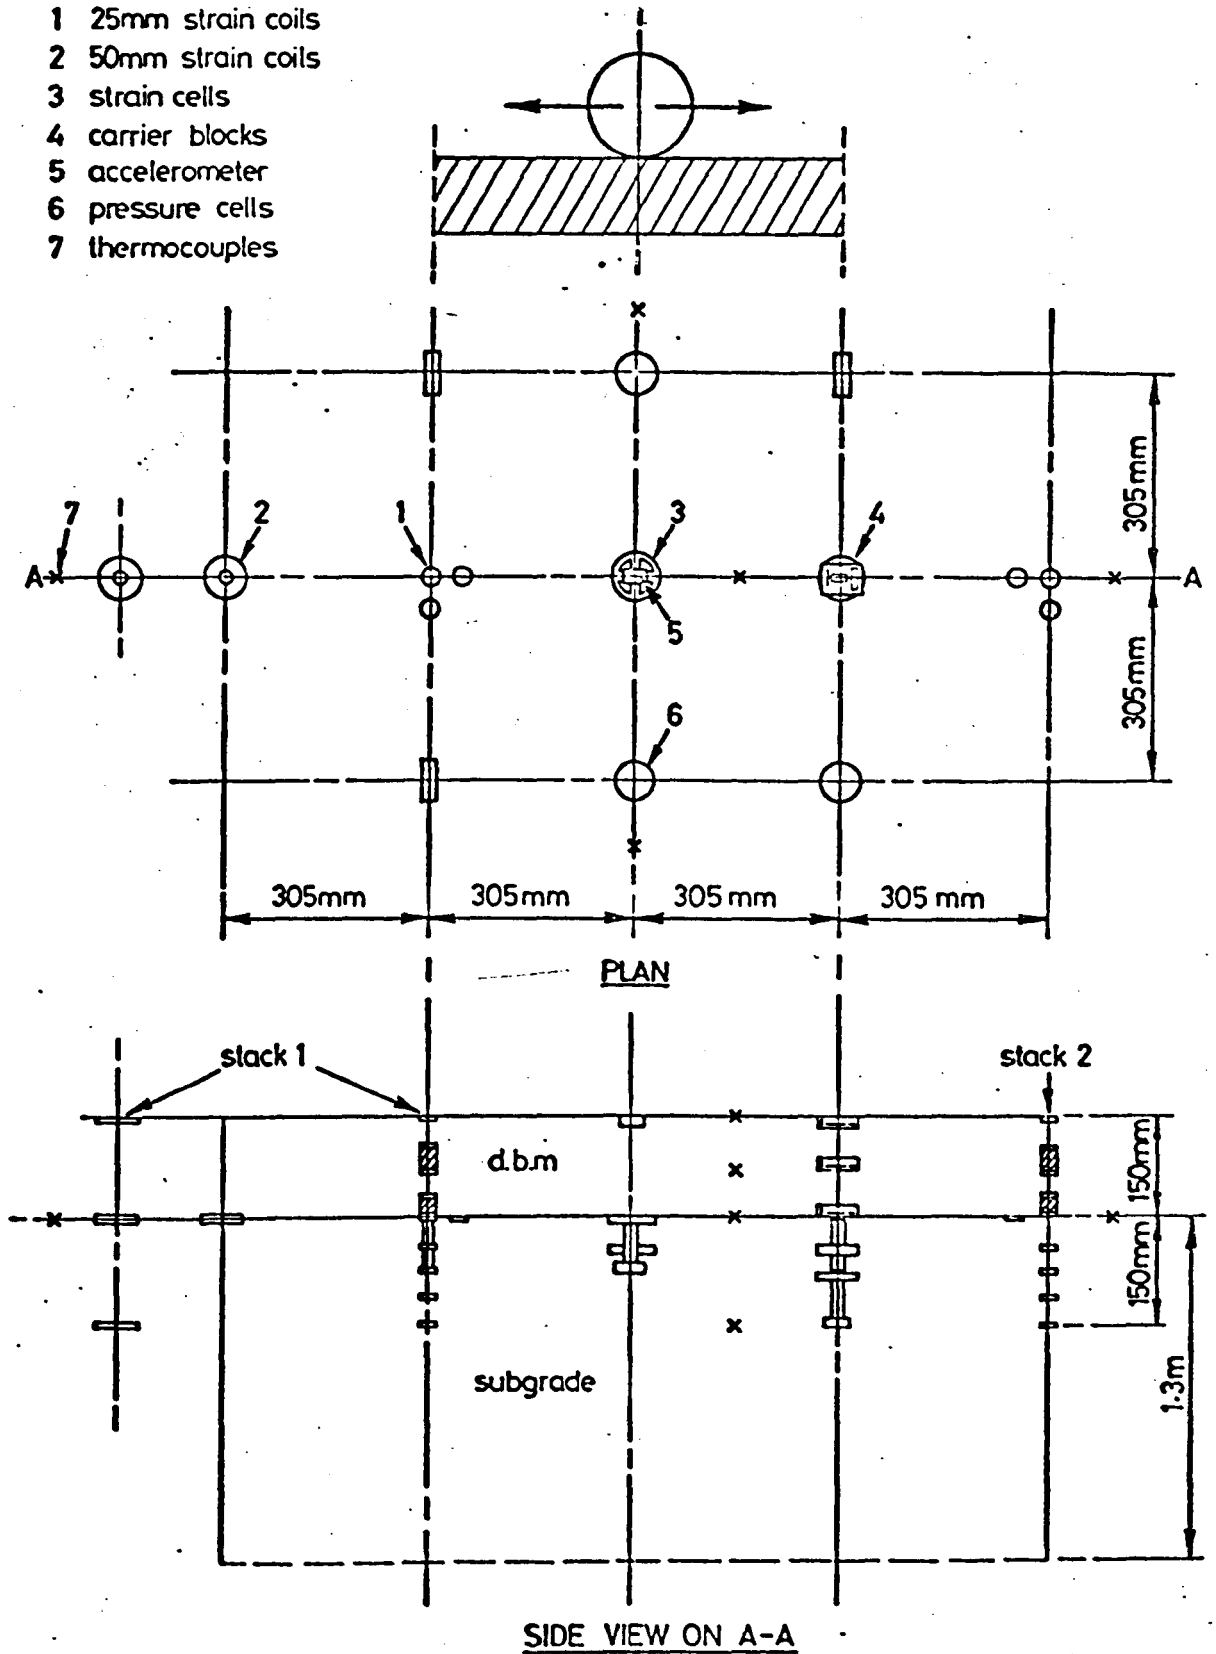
INSTRUMENT LAYOUT, PAVEMENT NO. 1
